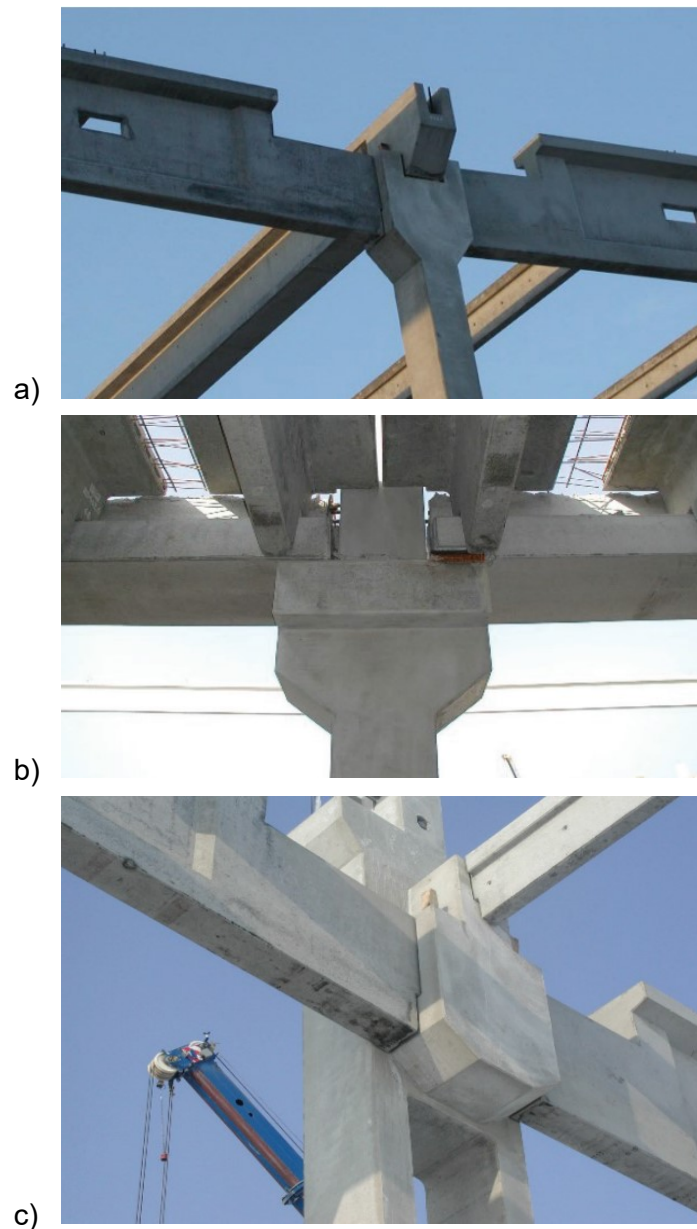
Examples of connections in precast concrete elements, provided by Holly, I. and Abrahoim, I. (2020) (1)
